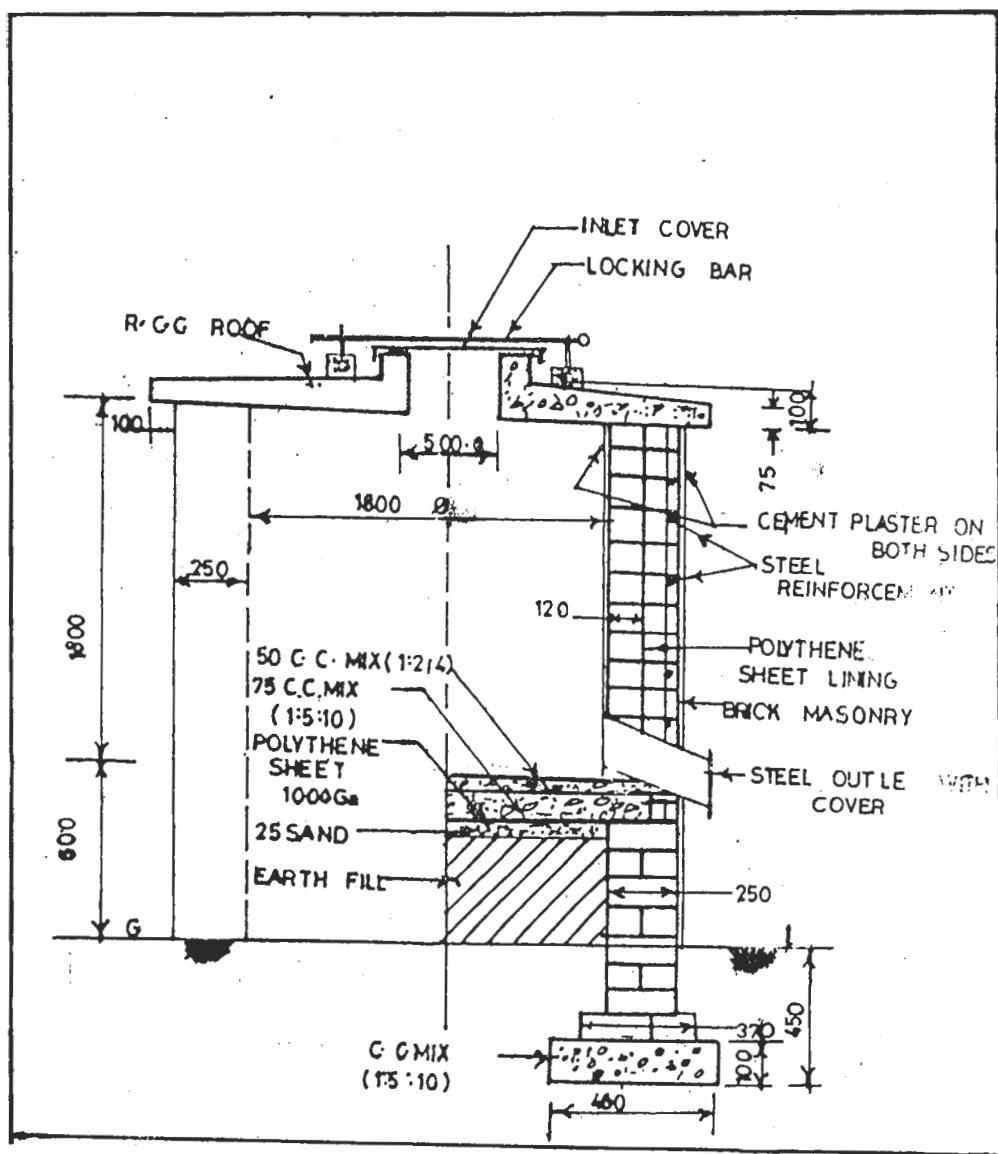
Reinforced Brick Masonry Structure Capacity 6.1M^3 or 4.6MT
